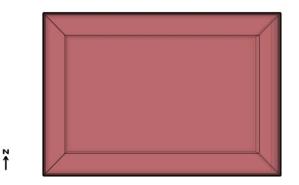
Plan of the thermal zones on each floor.
